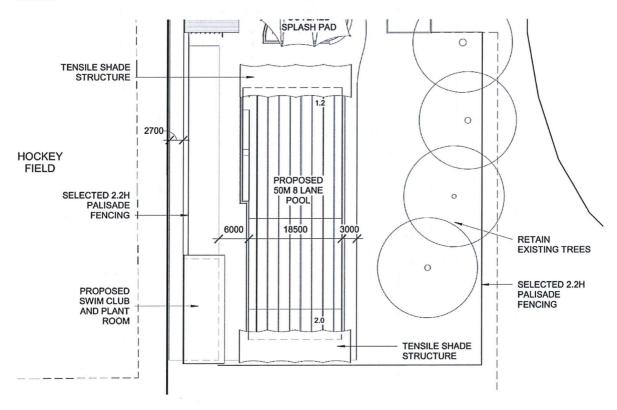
Proposed outdoor pool, swim club and plant room and associated outdoor space
